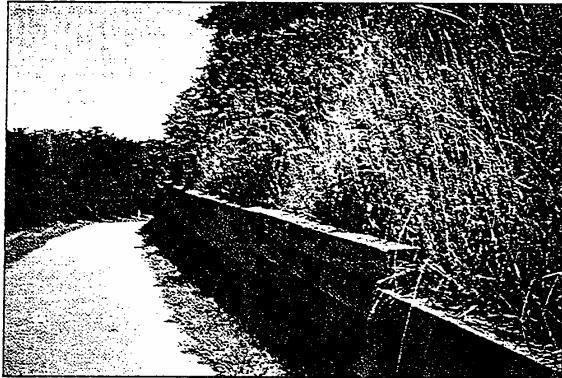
Timber Retaining Wall (Source: NRCS Engineering Field Handbook)
